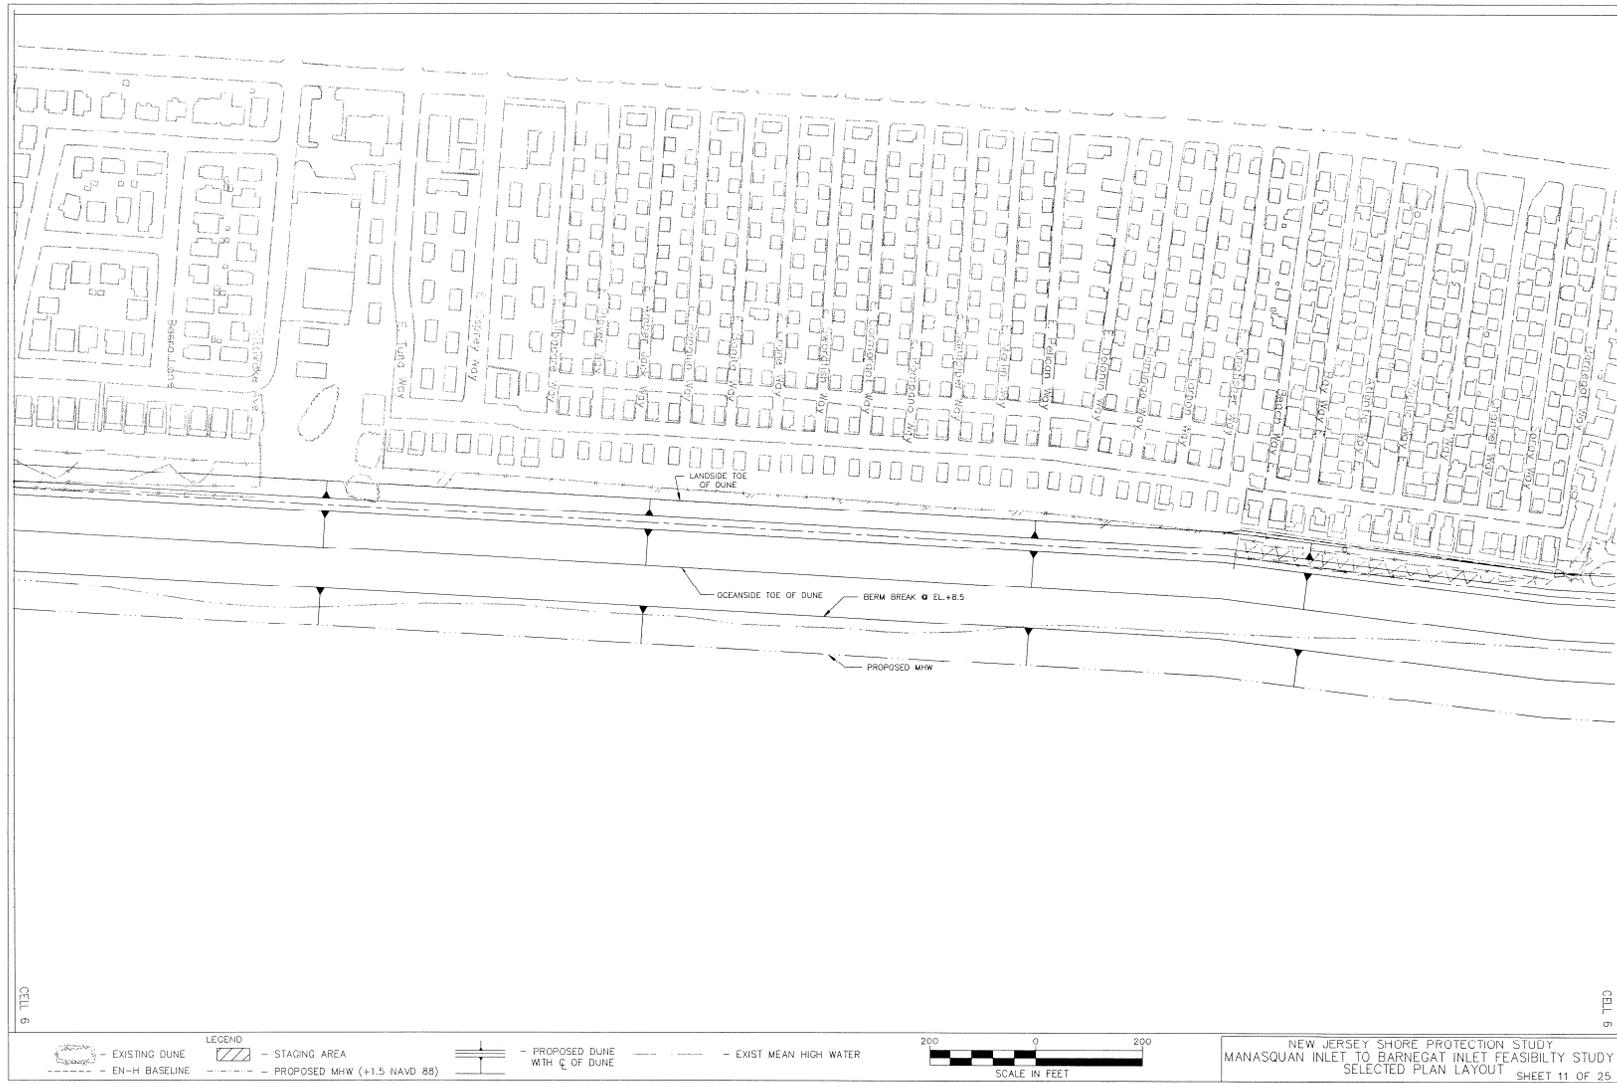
Selected Plan Layout – Dover Township, Ocean Beach to Chadwick Beach
